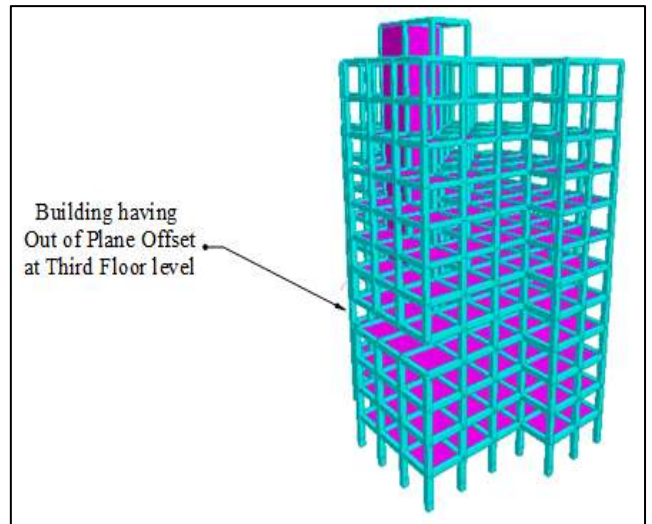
OPO Case 3 - Residential Apartment having out of plane offset provided at 3rd floor level
